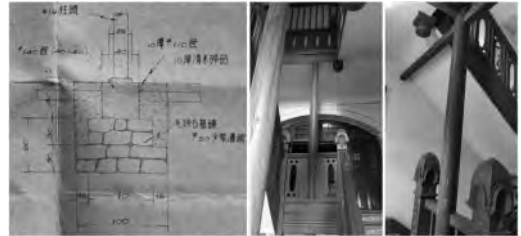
Insertion of timber columns for strengthening the main timber stairs of Anderson Hall in 1952 (source: Soochow University Archives, JJ152; photos from on-site survey 2019).
